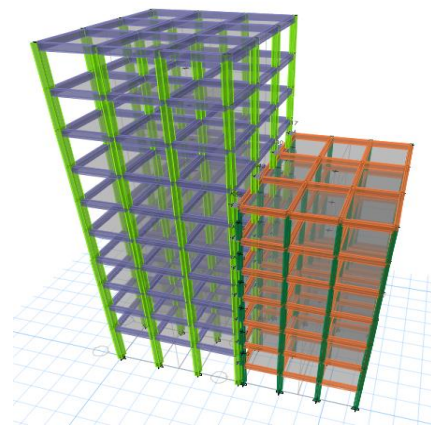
3D view of G+9 and G+6 storey buildings with gap element
